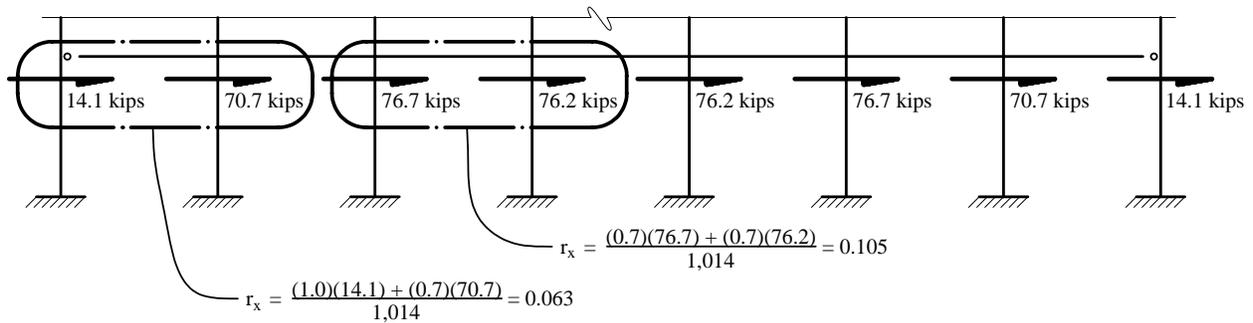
Column shears for E-W direction (partial elevation, Level 2) (1.0 kip = 4.45 kN).
